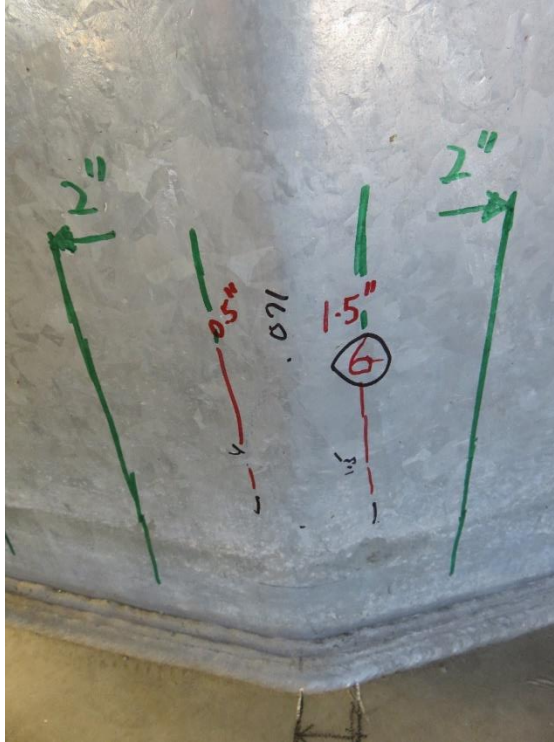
State of Cracks: Specimen 33-3-12-TX-A2 – Bend 6
